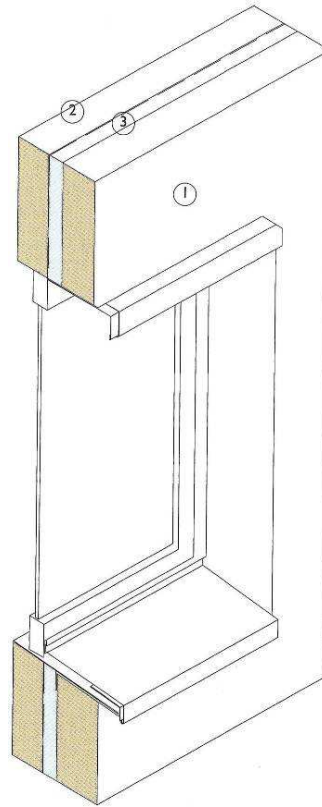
Isometric view of an *in situ* load-bearing concrete wall: 1 and 2 - Concrete external and internal walls, respectively; 3 - thermal insulation (Watts, 2005)
